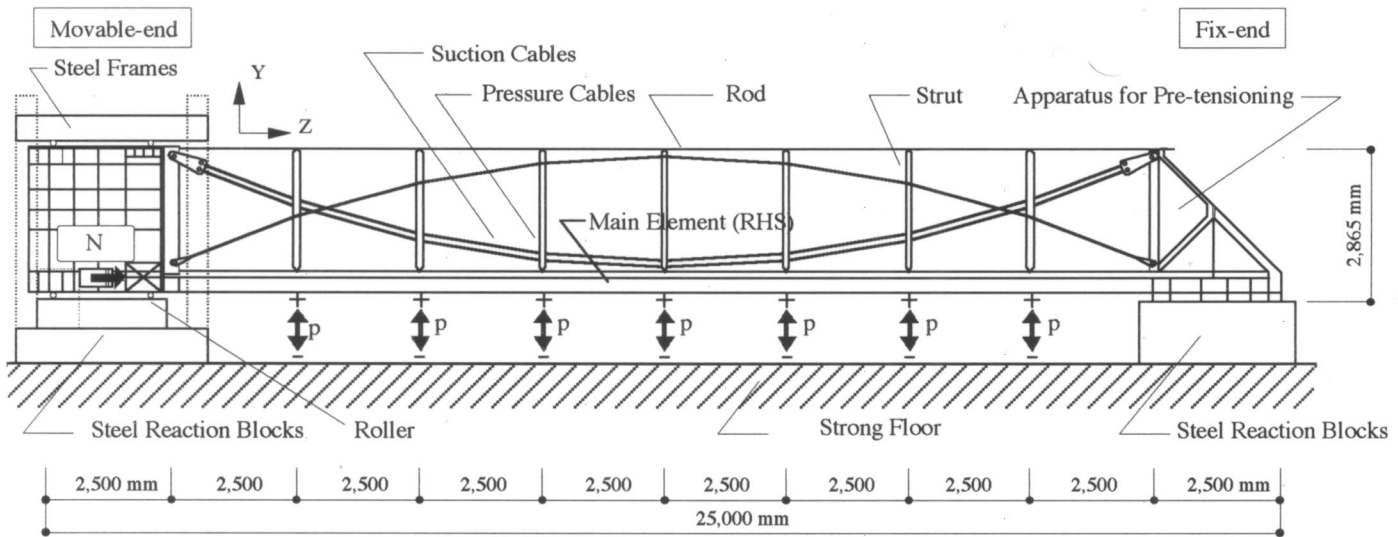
(b) shows details of the cable truss, for example, of 25 m height. The cable truss consists of two pairs of pre-tensioned cables, a main element (rectangular hollow section), struts and a rod. Each cables is fixed to a
